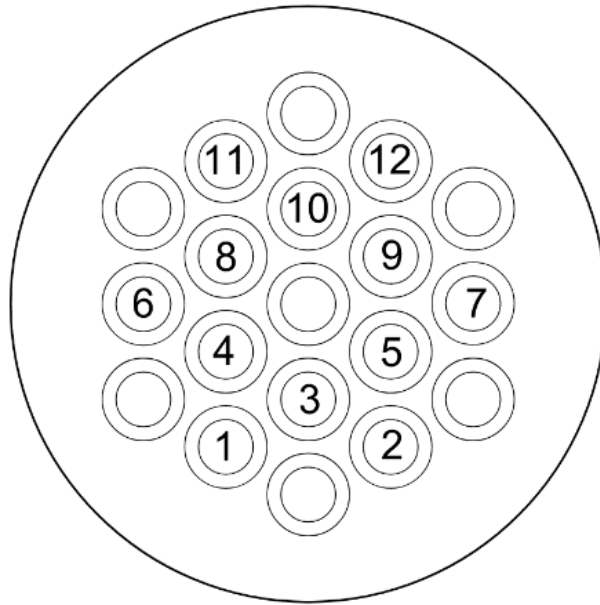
Layout of prestressing strands in post-tensioning anchor heads for specimen S12.
